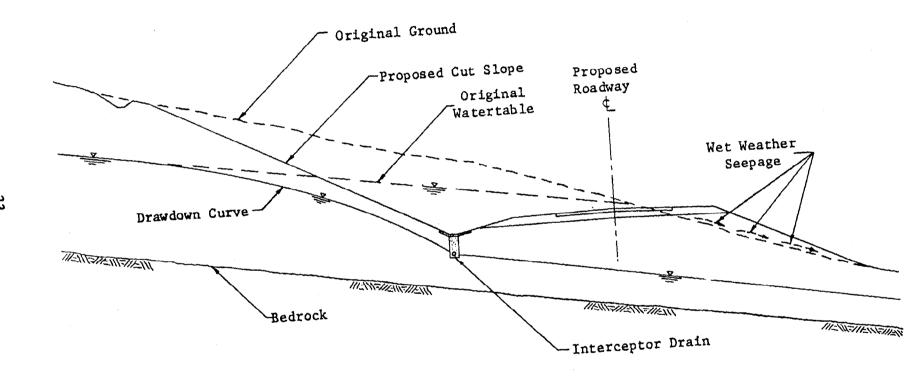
Longitudinal Interceptor Drain Used to Cut Off Seepage and Lower the Groundwater Table
